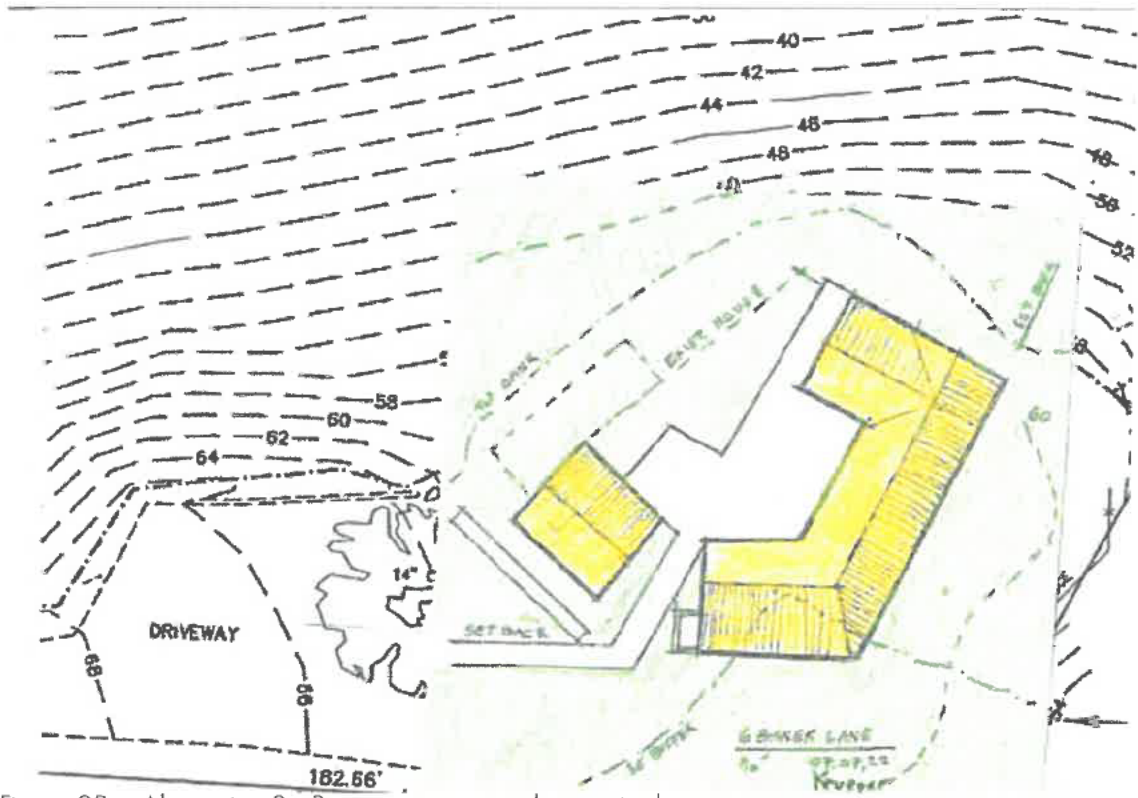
B – Alternative 3 - Reconstruct a new, larger single-story structure
